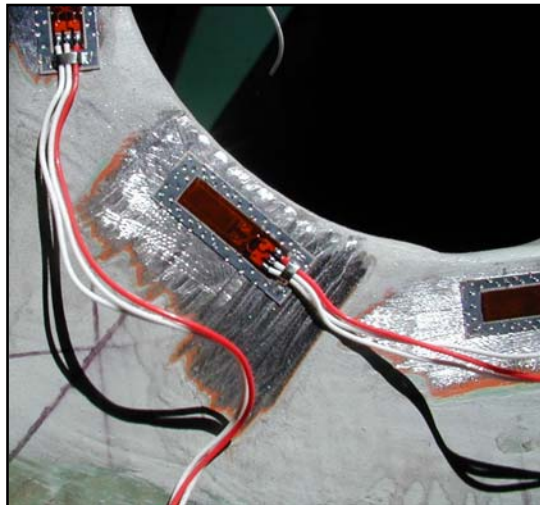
Typical strain weldable uniaxial gage at installed at cope
